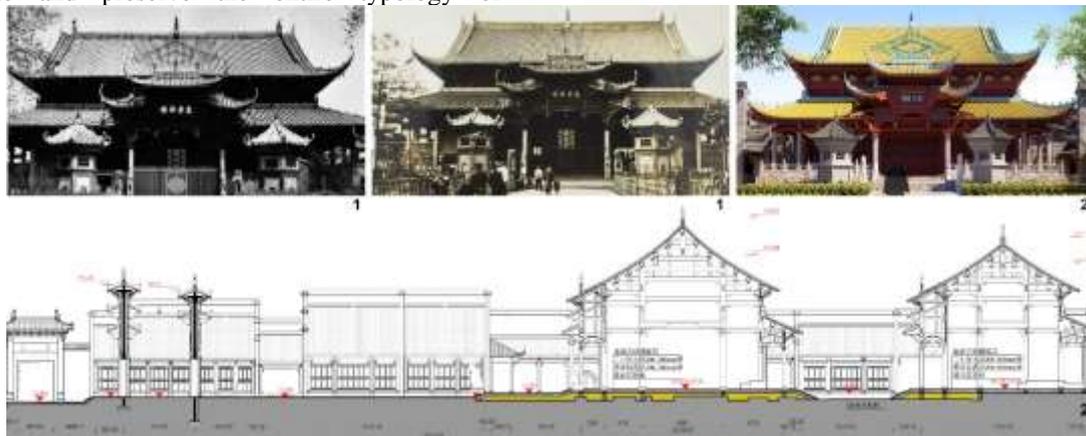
Wanshougong monastery before (1) and after (2) reconstruction (drawing by Wang Guixiang studio).
